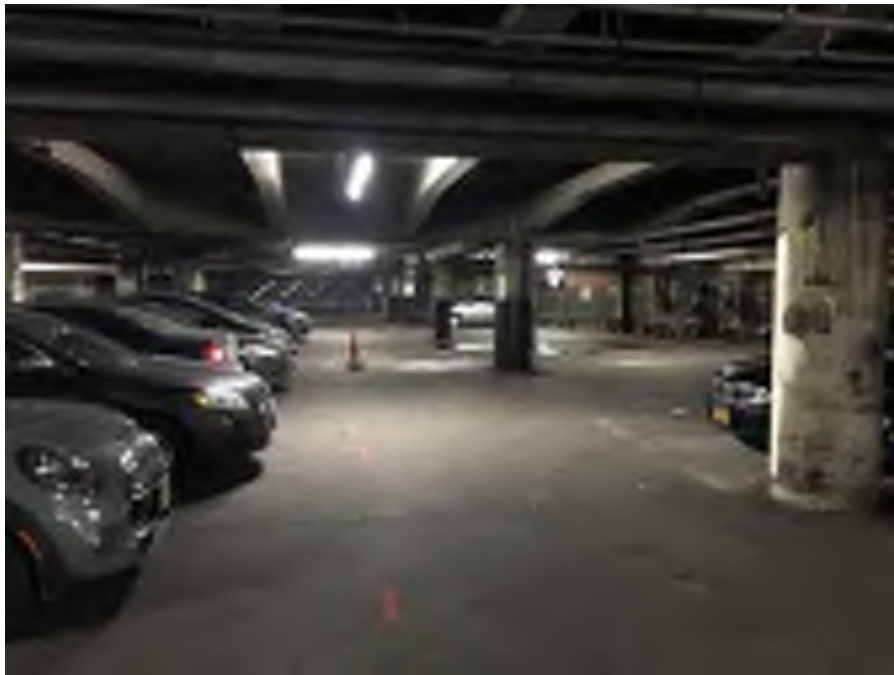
view of marked utility line and installed sub-slab vapor point SV01. (facing east)
